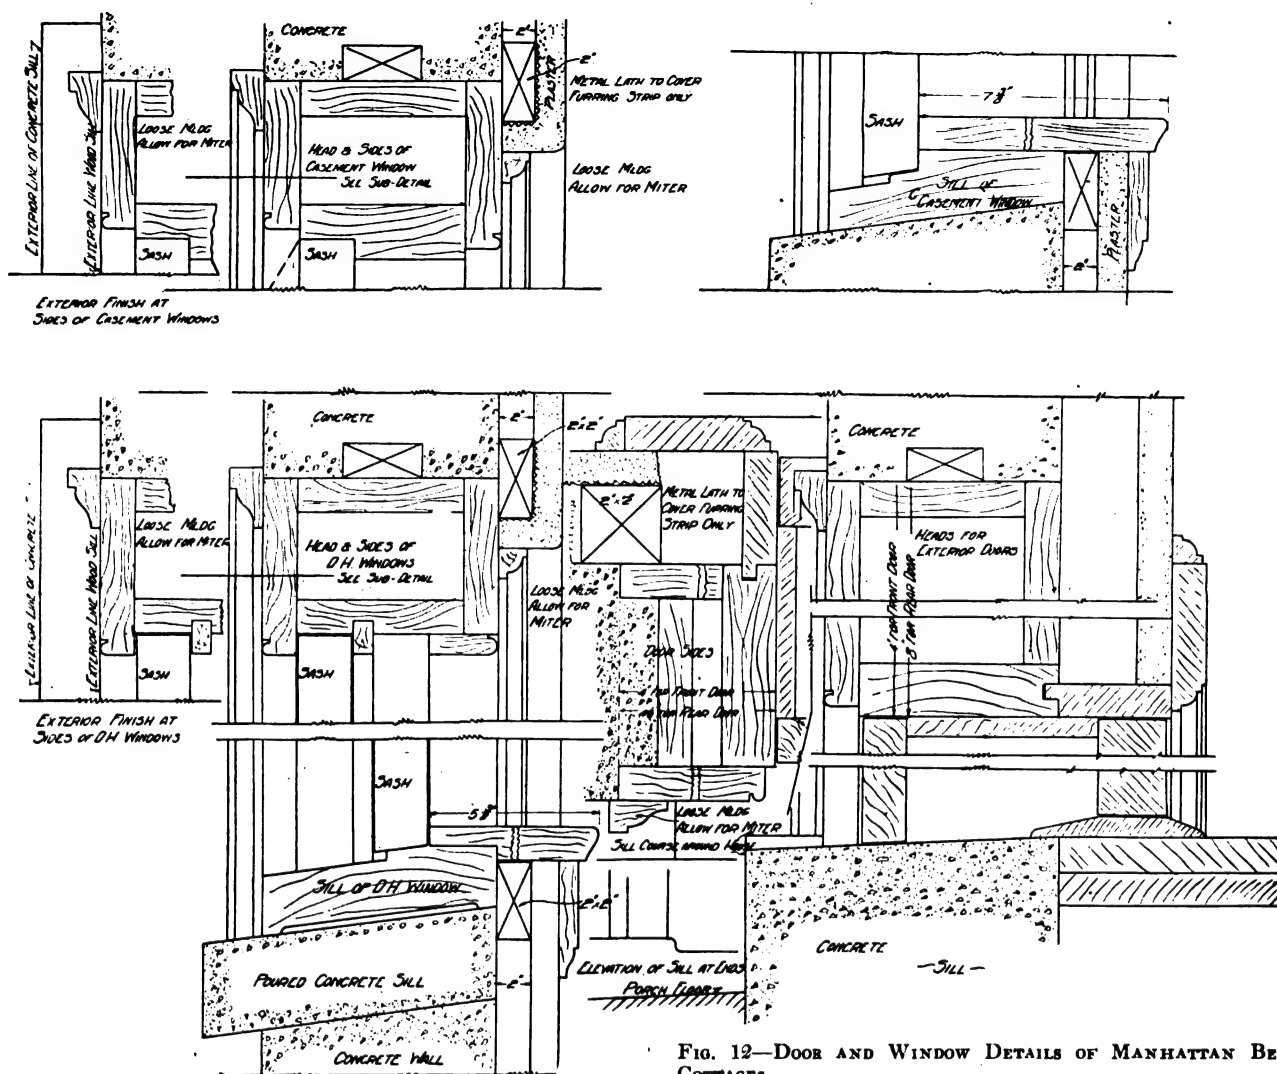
DOOR AND WINDOW DETAILS OF MANHATTAN BEACH COTTAGES
